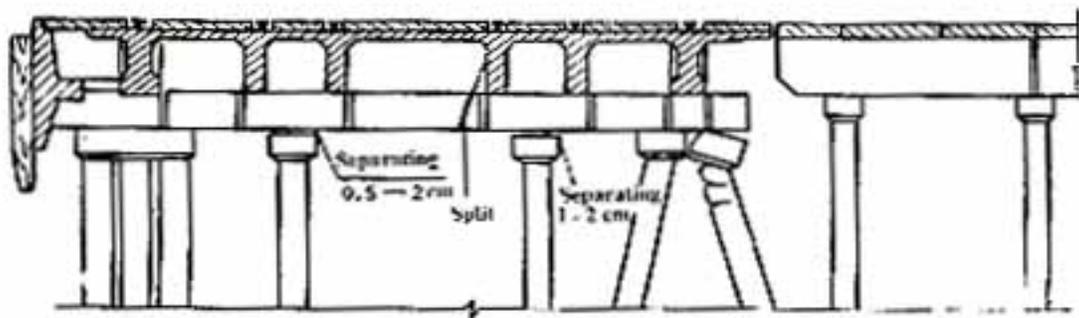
A sketch showing damage to a crossbeam of the No. 14 and No. 15 berths at the New Port of Tianjin.
